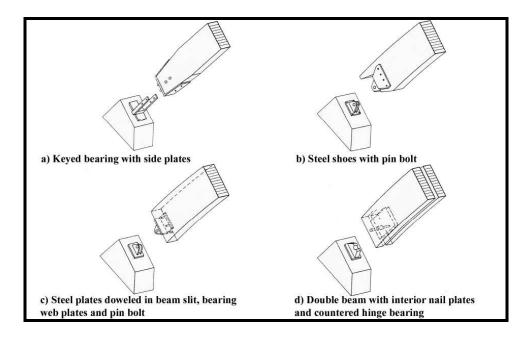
Base bearings of arches, the system can be also used in frames and beams (Götz *et al.*, 1989:147).
